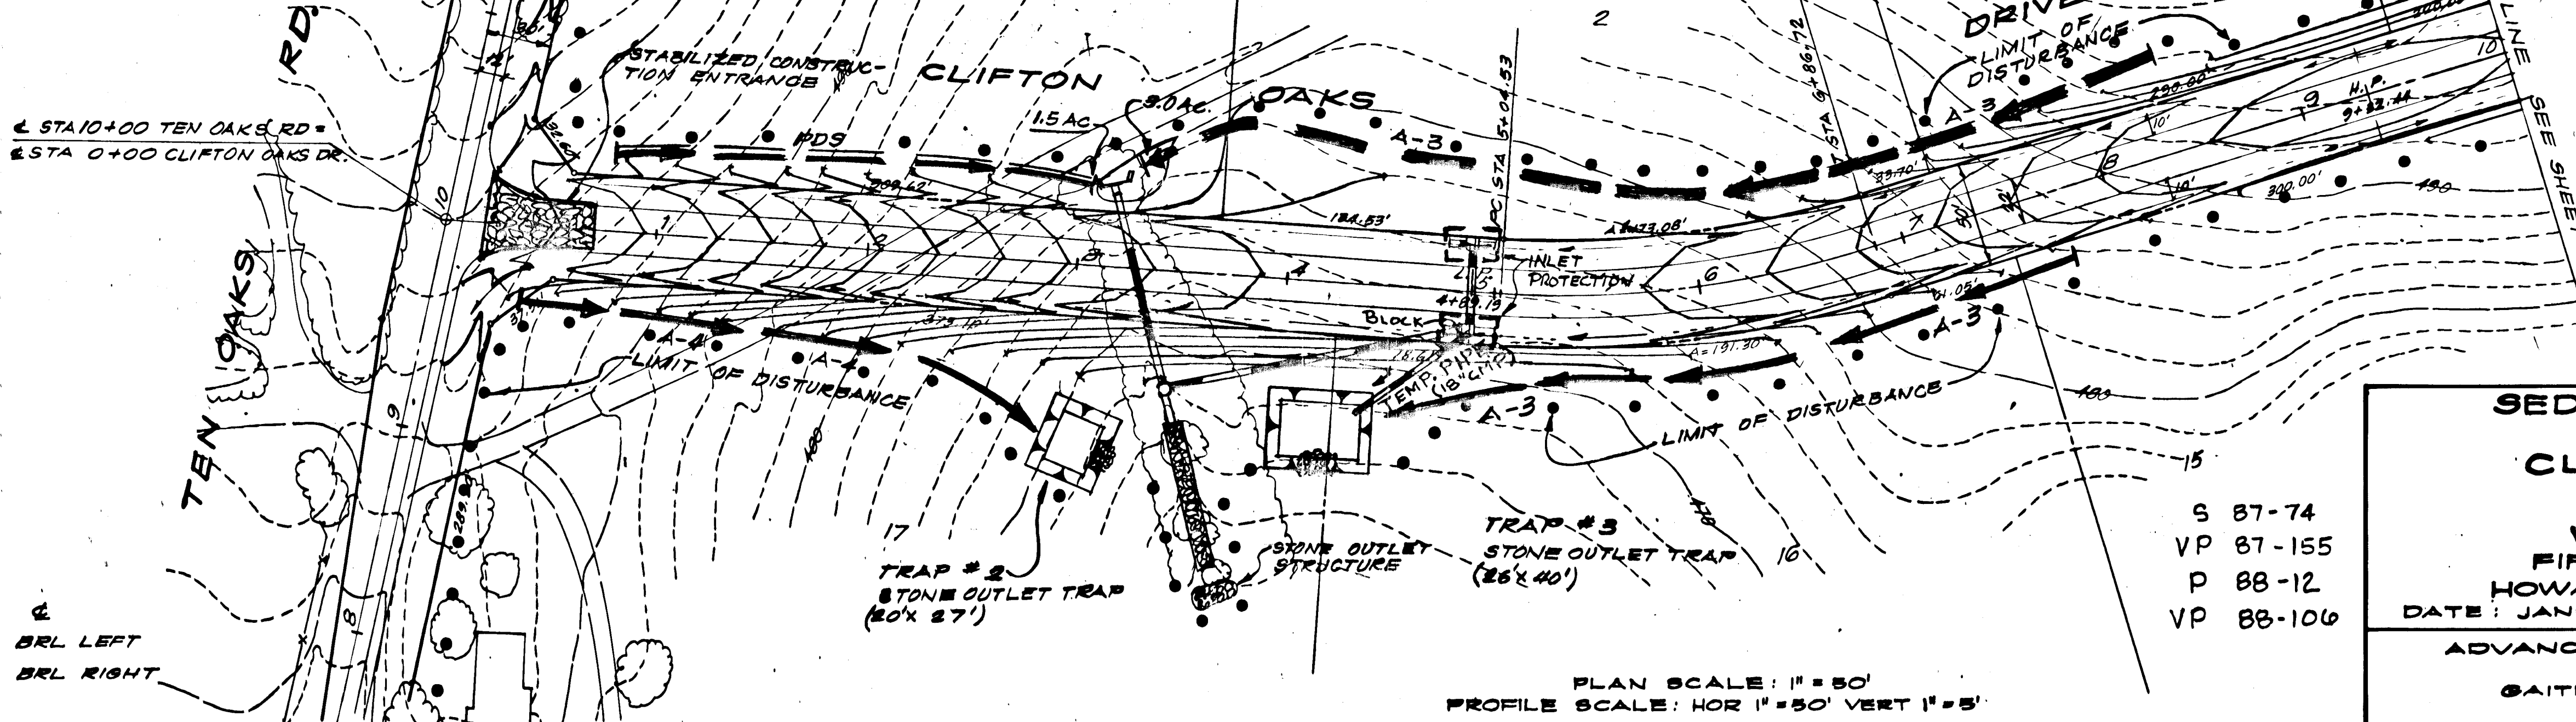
SINGLE PLAN AND PROFILE FULL LINE
